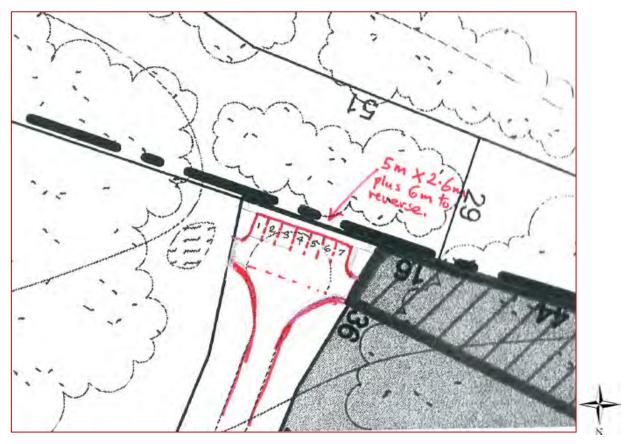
Indicative Location of Parking Bays at Cul-de-sac End of Beaufortia Gardens Road Reserve
